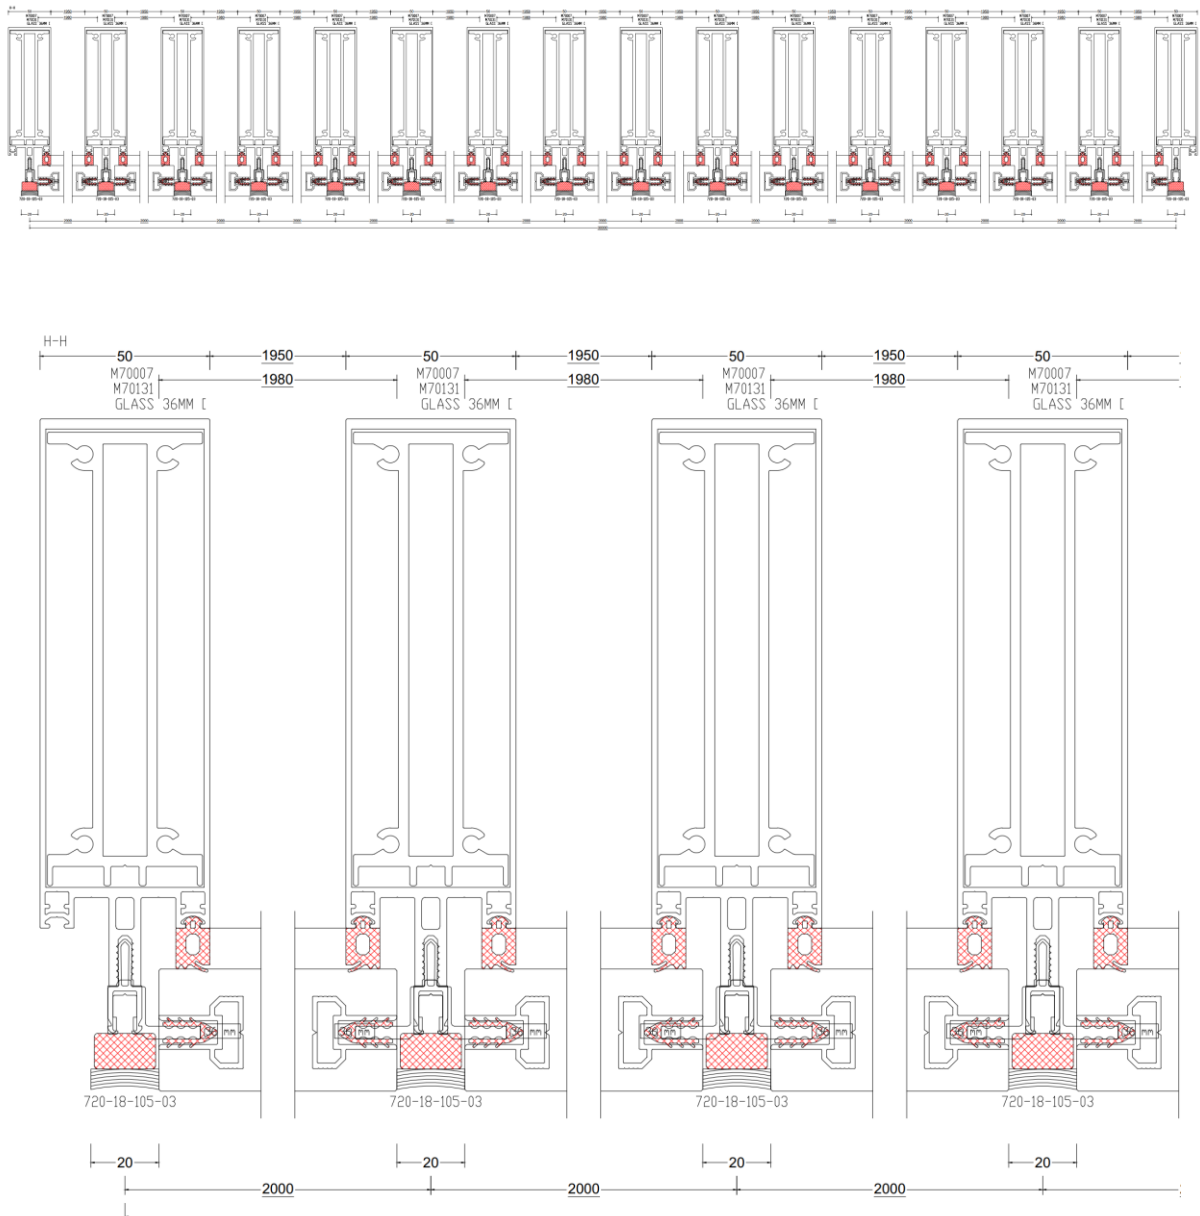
Section Drawing detail of curtain wall used in 3D modelling (vertical aluminum profiles).
